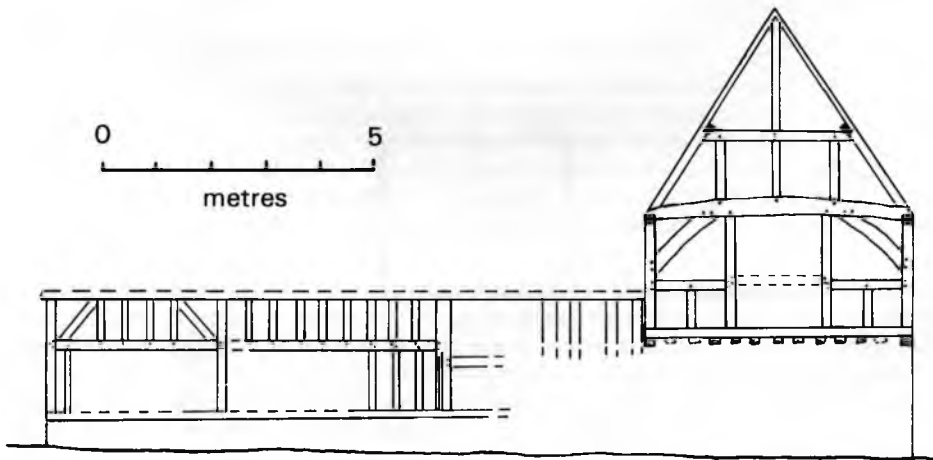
66 CHURCH STREET: SKETCH ELEVATION OF EXPOSED FRAMING MADE IN 1979 (GABLE-END NOT TO SCALE).
